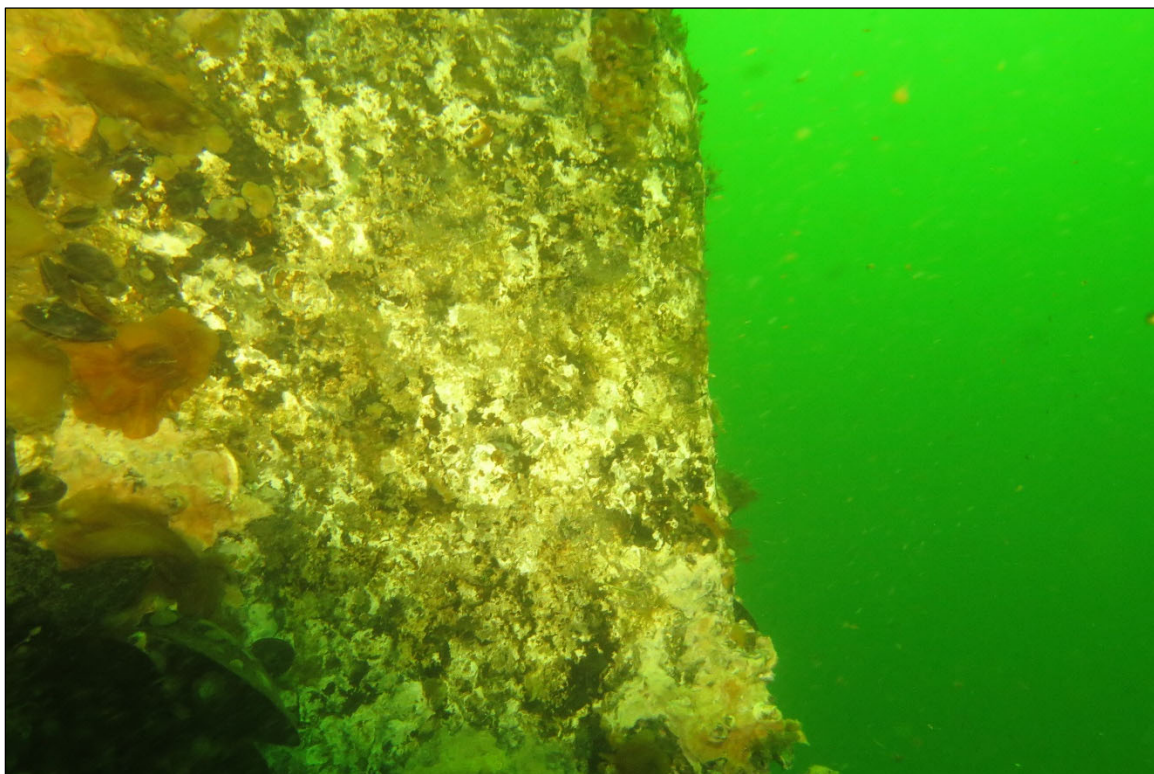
Typical Condition of Concrete on Cleanout Chamber Base Structure.
